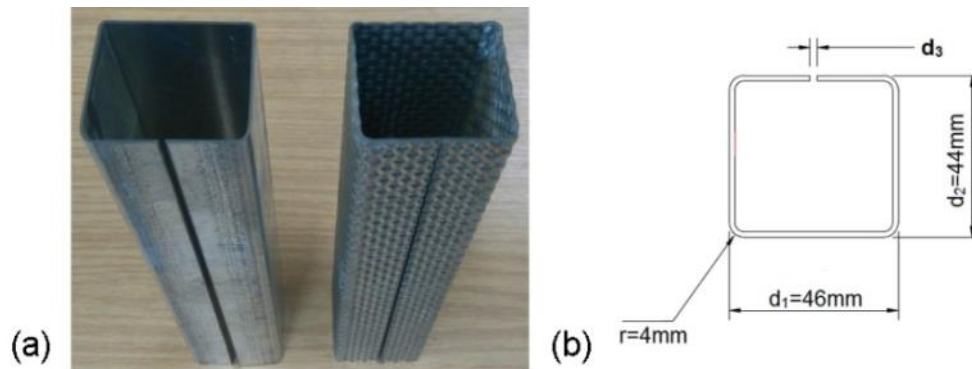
(a) Plain and dimpled specimens and (b) Cross-sectional dimensions of specimens
